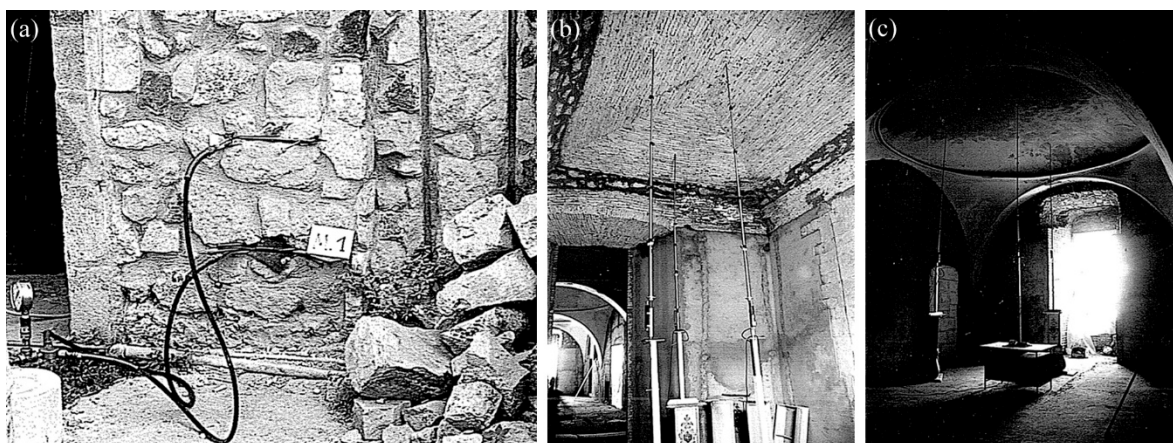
Some construction details included in the project of restoration of the central part of the castle (from design documentation: arch. Giuseppe Zampino, 1988).
